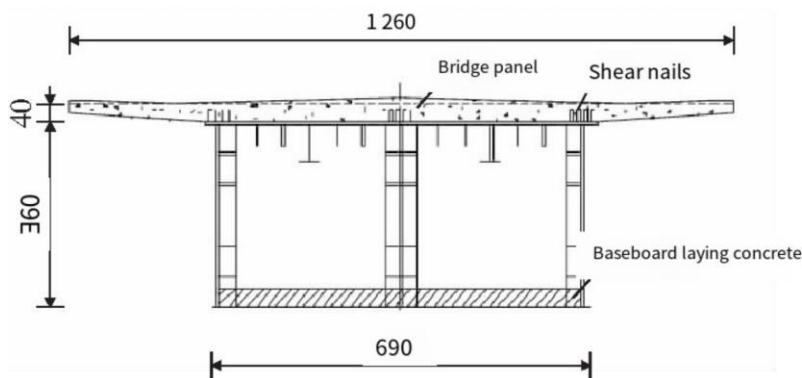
Cross section of the main beam of Chengcheng Large Bridge of Shanghe-Hangzhou High-speed Railway [6].
